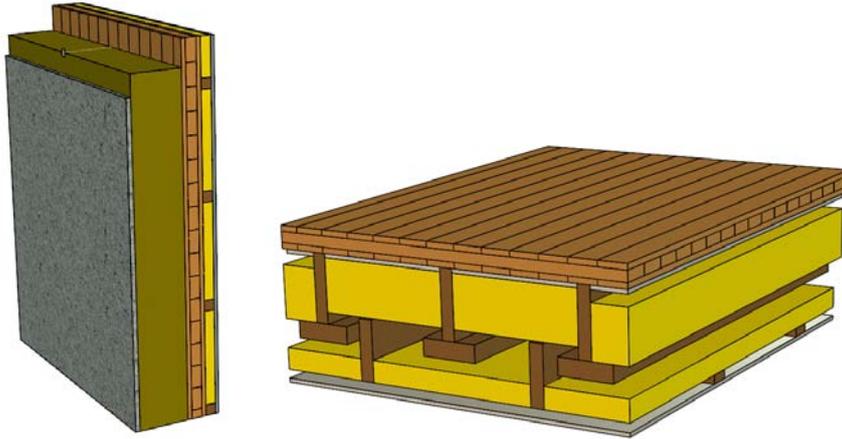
Typical design of the wall and floor elements used in Limnologen.
